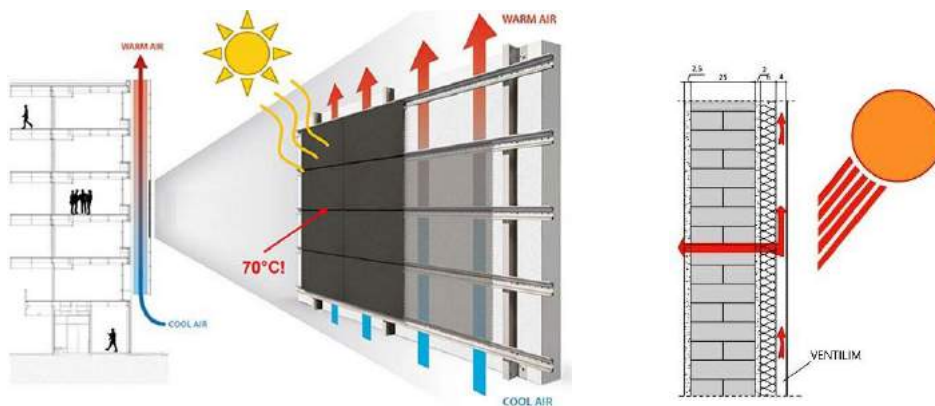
Ventiladed facade, for wall thermal insulation _ Option 2
